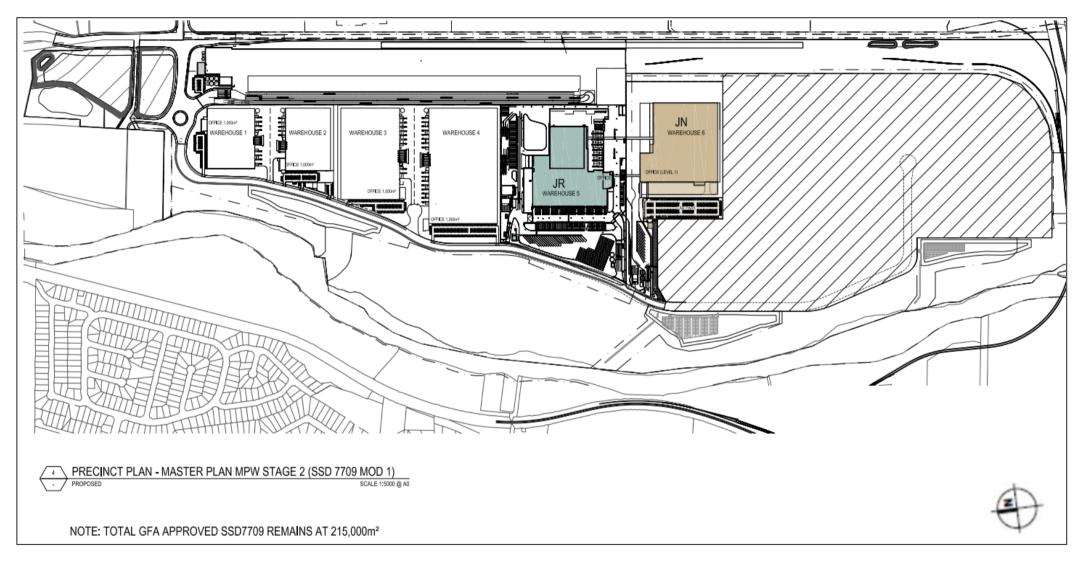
| Amended Precinct Plan approved under SSD 5066 MOD 2 and SSD 7709 MOD 1 (Source: Applicant's SSD 5066 MOD 2 report)
